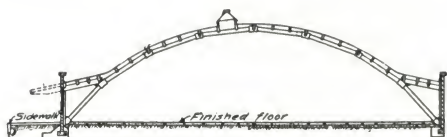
Fig. A. Simplest Type, Built with or Without Sidewalk Overhang
